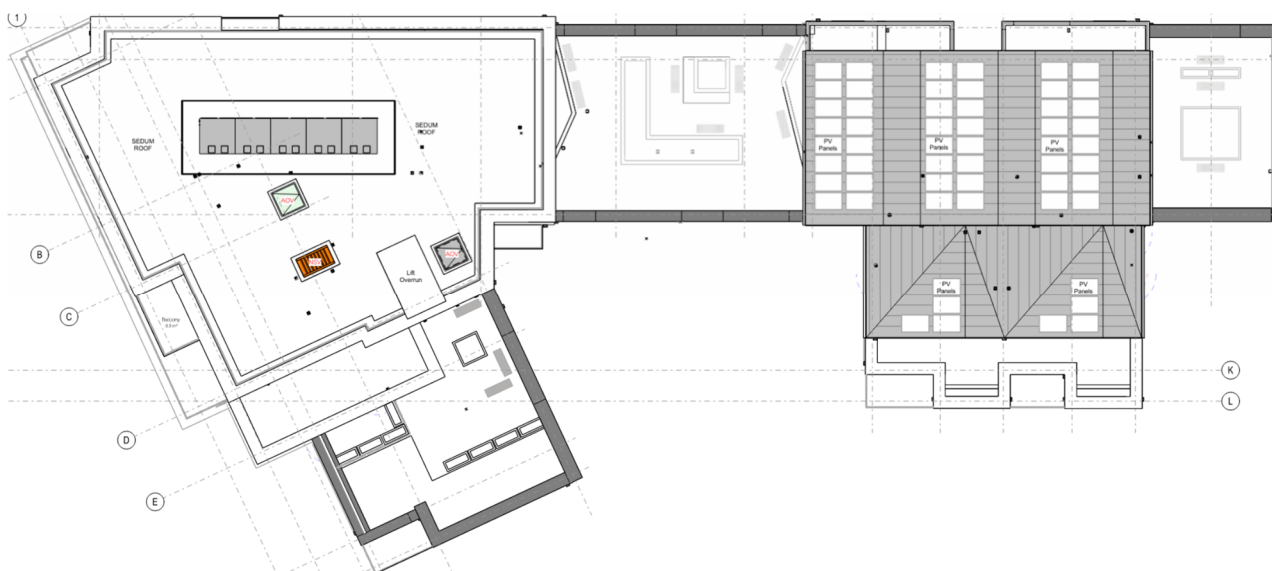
Roof layout (Dwg No: M9534-HUN-02-RF-DR-A-05-4005).
